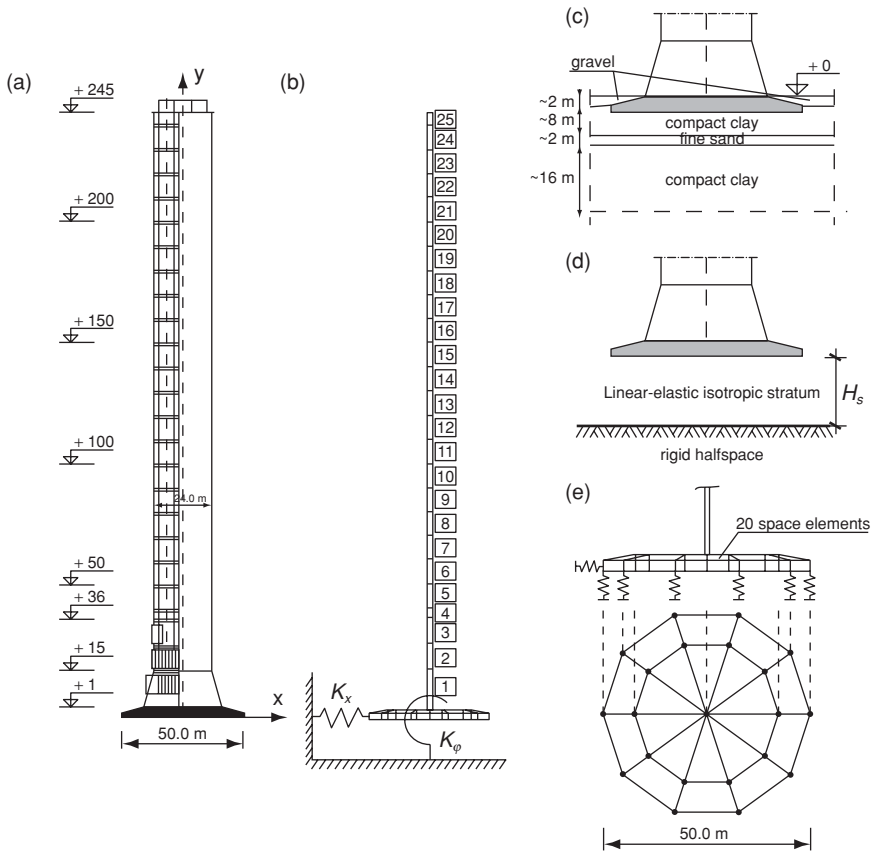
(a) View of chimney, (b) subdivision of the chimney into elements with soil springs, (c) description of the soil under the foundation, (d) model of the soil under the foundation to evaluate the soil spring, (e) subdivision of the foundation slab
